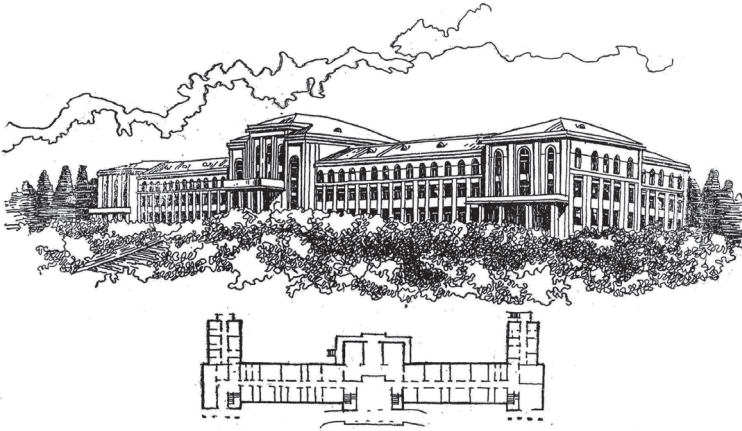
(Above) Main building of Kim Il-sung University; (Below) Floor plan of Kim Il-sung University's main building
